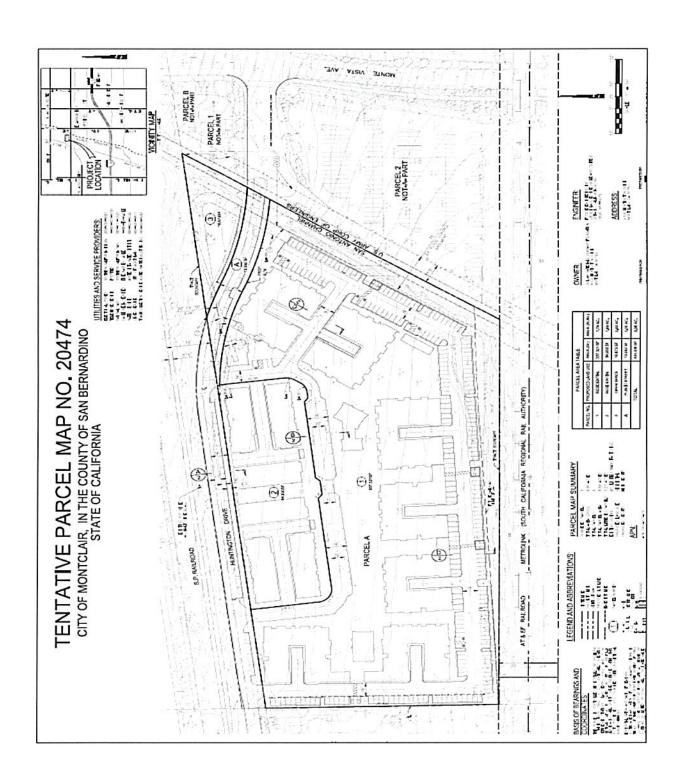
Exhibit B – Design Plans (Selected Images) Exhibit C – Planning Commission No. 22-1968
